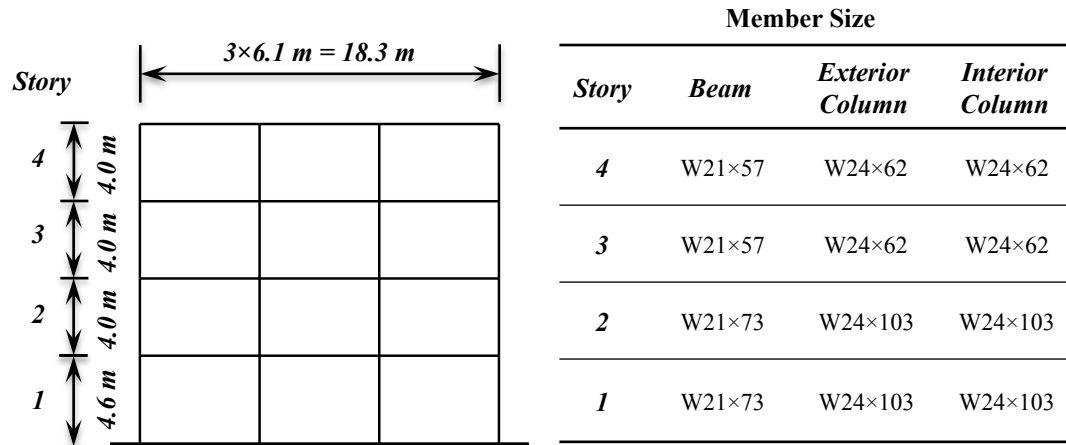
Elevation of building S-4 and the beam and column member sizes.
